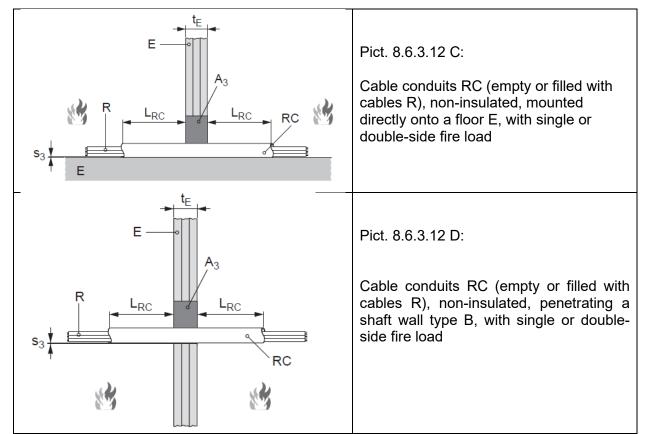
Several electric penetrants in zero distance, mounted onto floor or free in wall, in shaft wall system B
